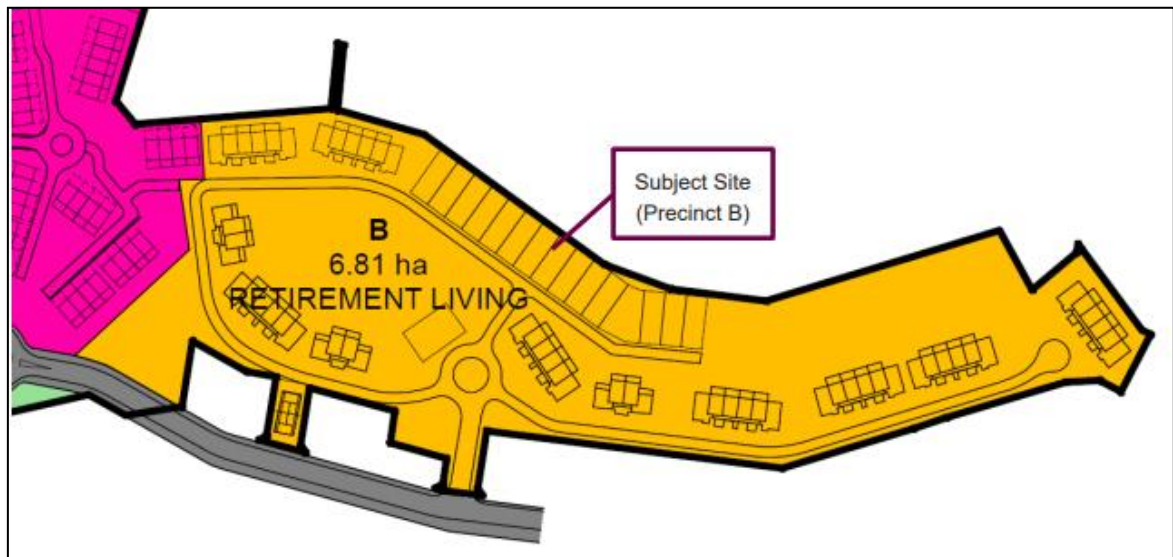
Extract of approved Concept Plan sourced from applicants Modification Report
